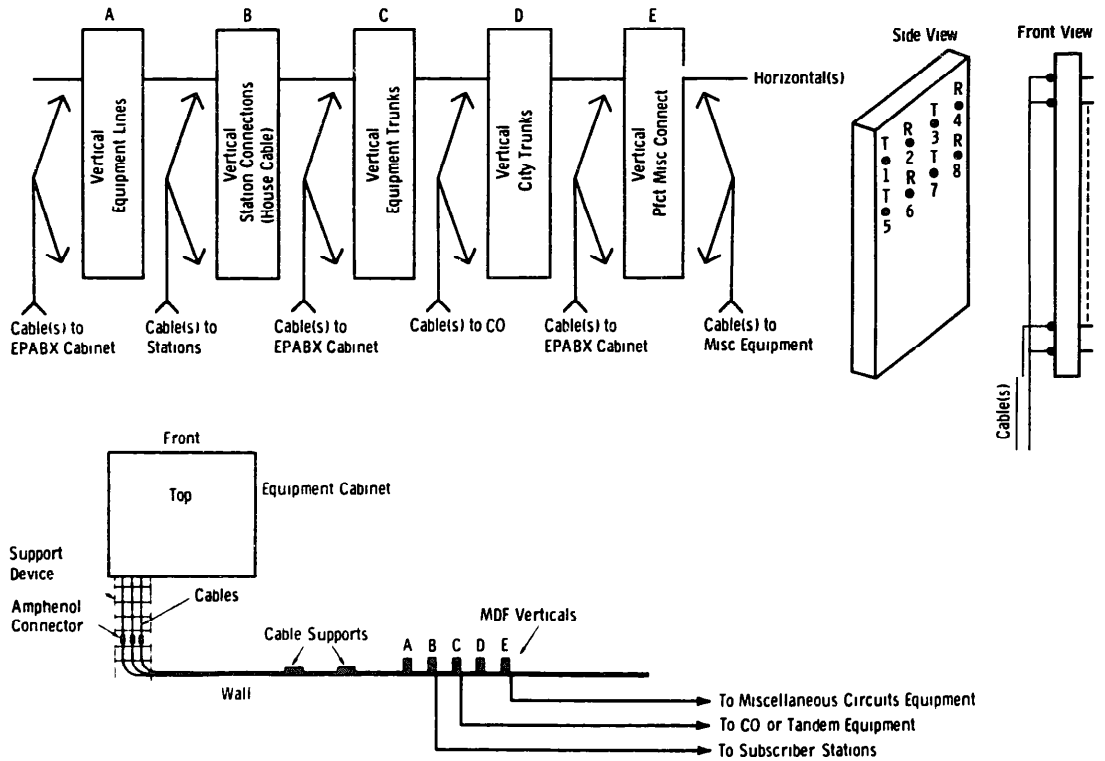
Typical Single Cabinet TE-400 System and MDF Layout.
